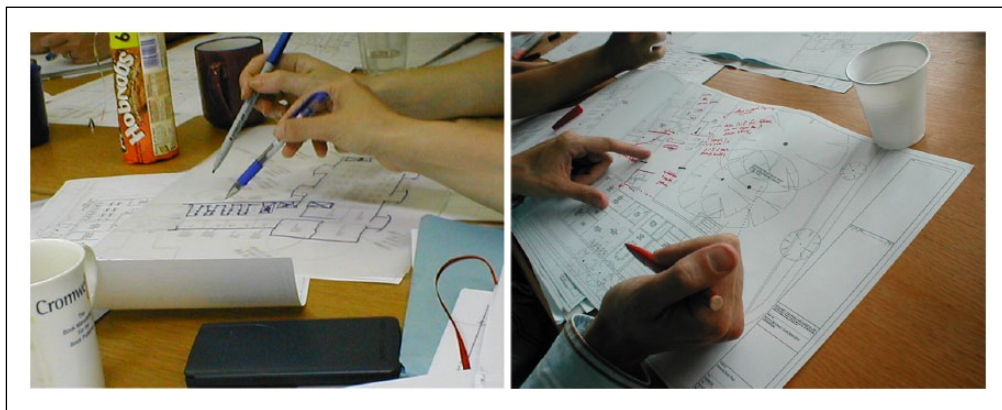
The architects sketching on tracing paper over existing plans (left) and annotating existing plans (right).
